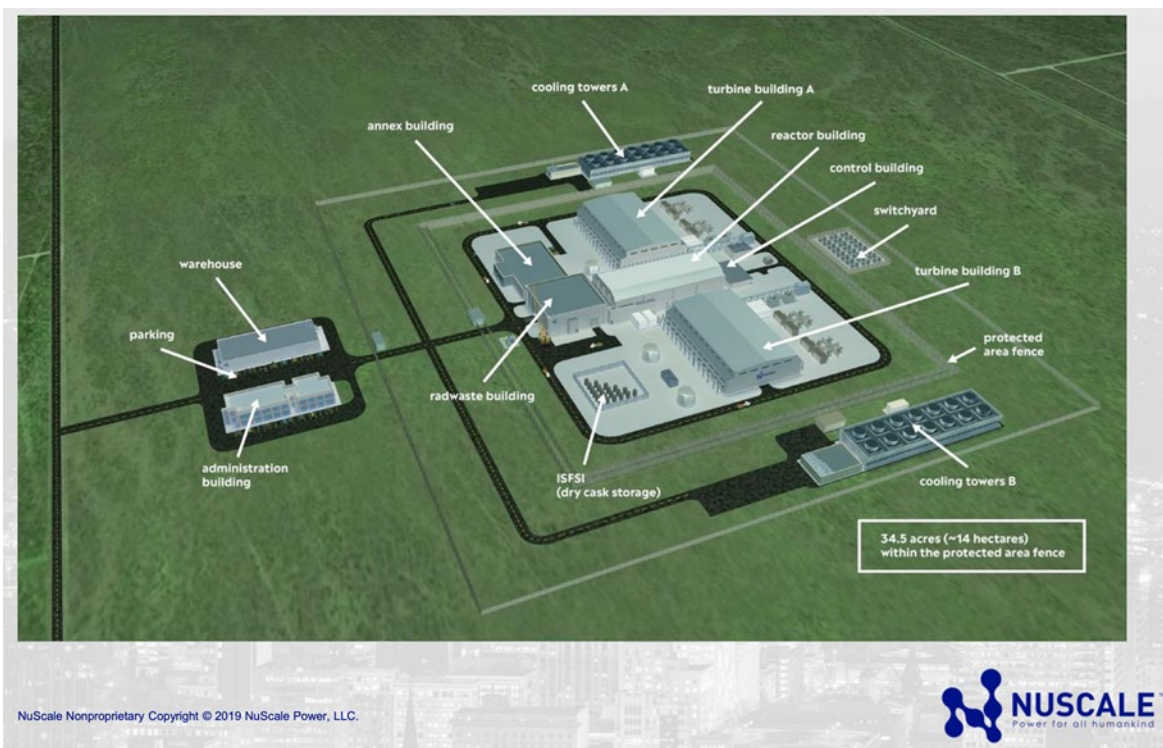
NuScale facility layout—note dry cask storage in southeast corner.
